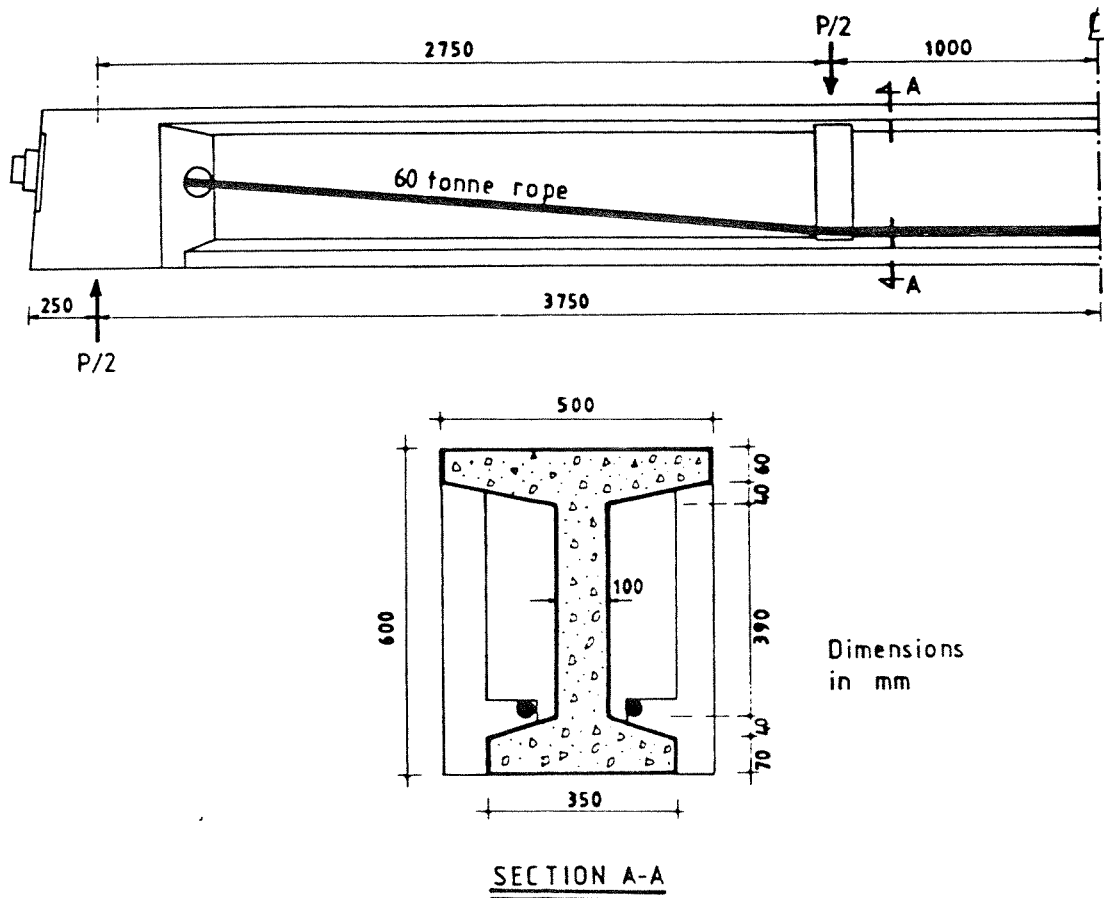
Half views of 8m long prestressed beam tested at Imperial College. Prestressed with two 60 Tonne Type G Parafil ropes.
